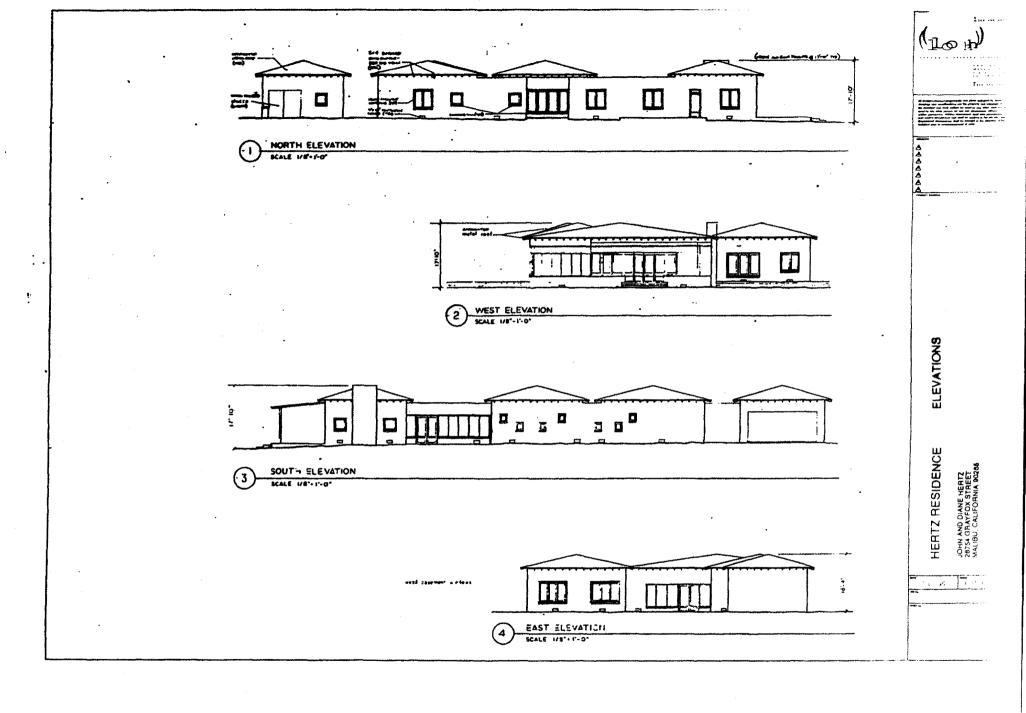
(4-97-088) Elevations for Proposed Single Family Residence
